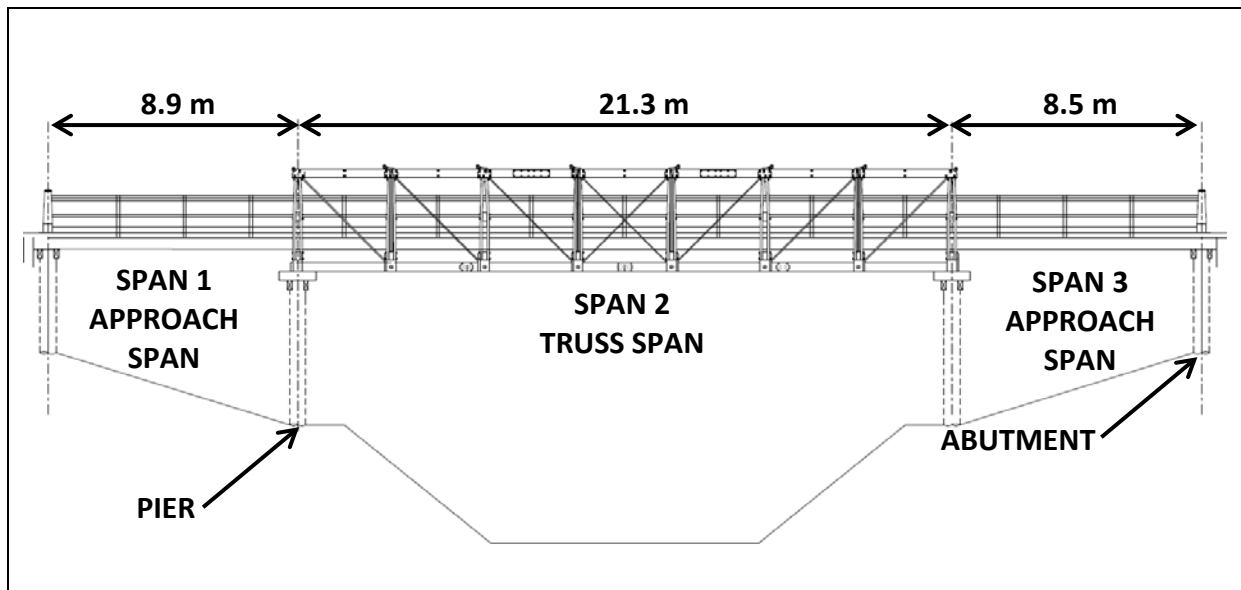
General Arrangement of Gillies Bridge (source: author)
